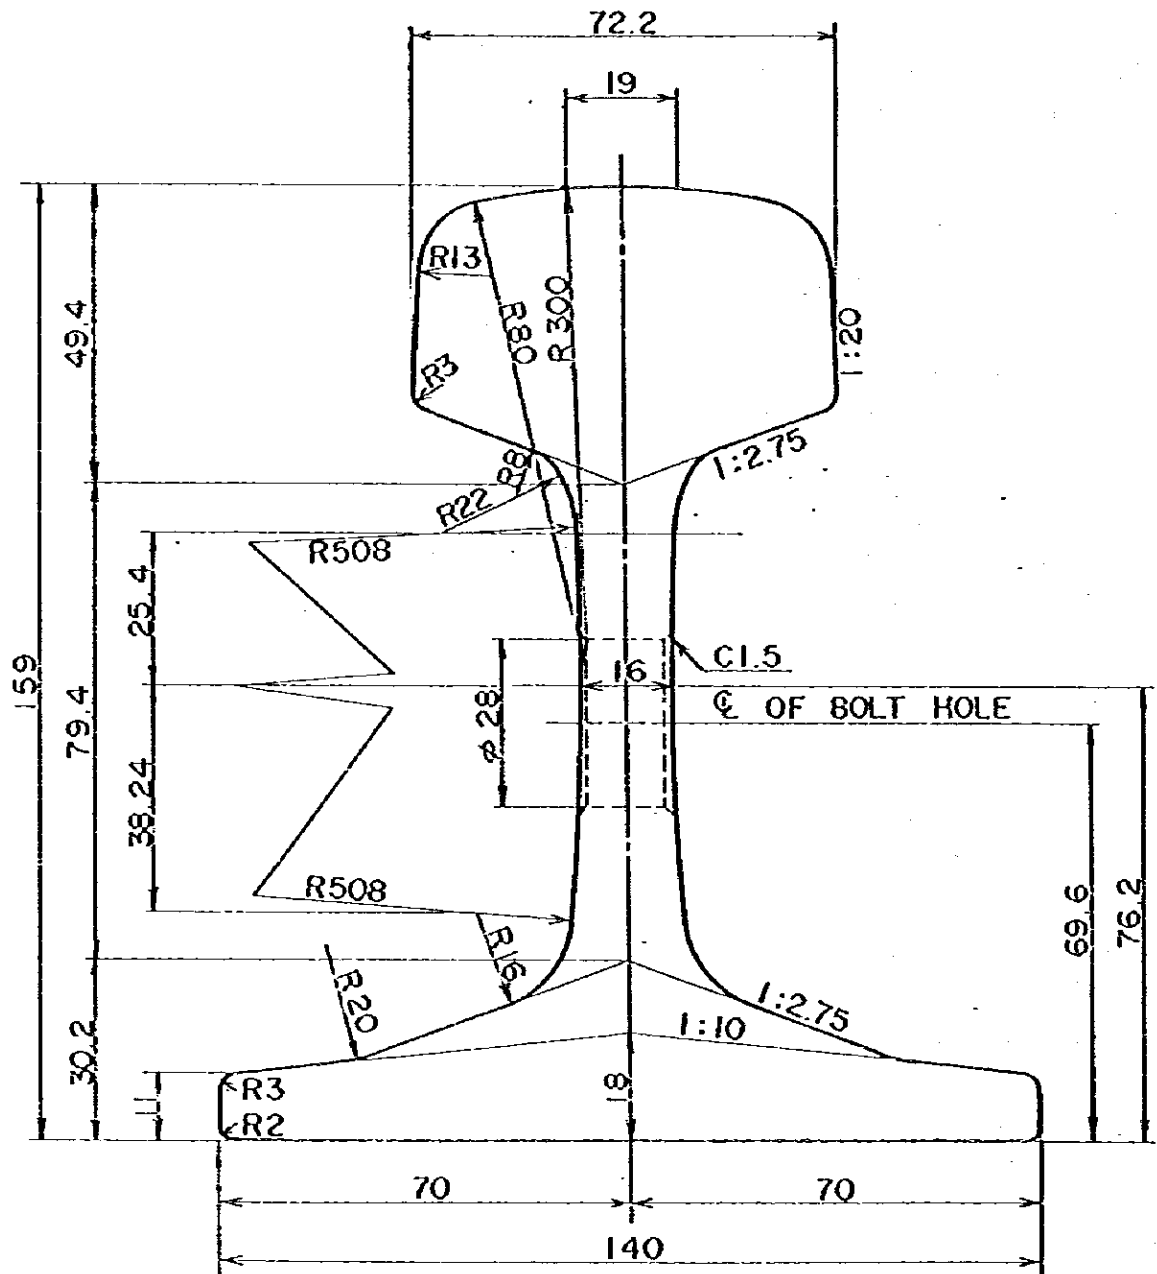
R54 Rail Section (54.4 kg/m)
